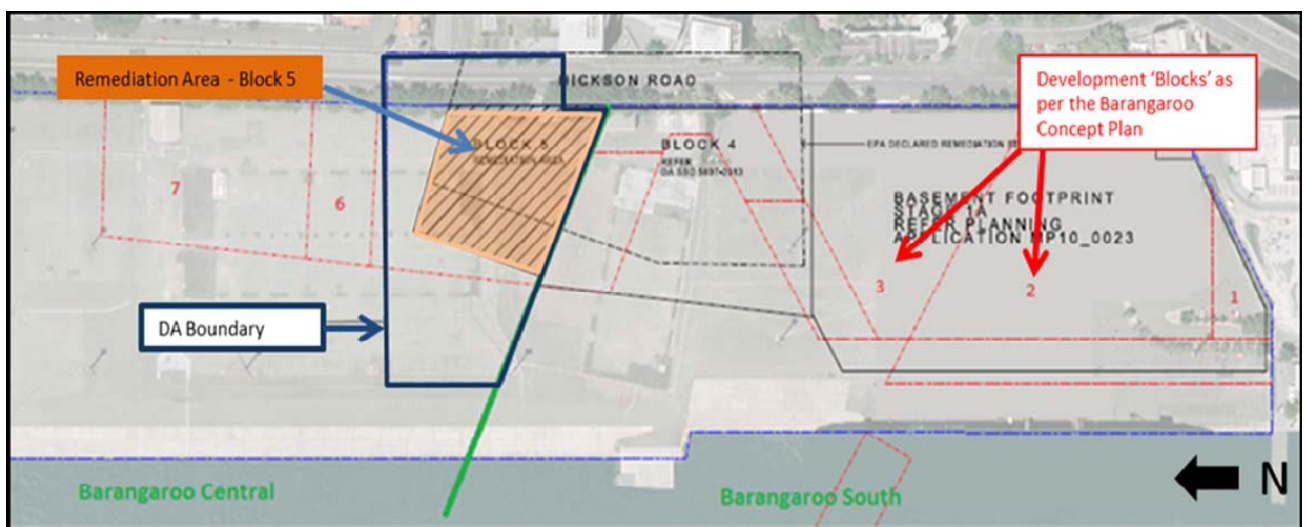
Block configuration at Barangaroo South and Barangaroo Central and location of remediation works in Block 5 (hatched area)
